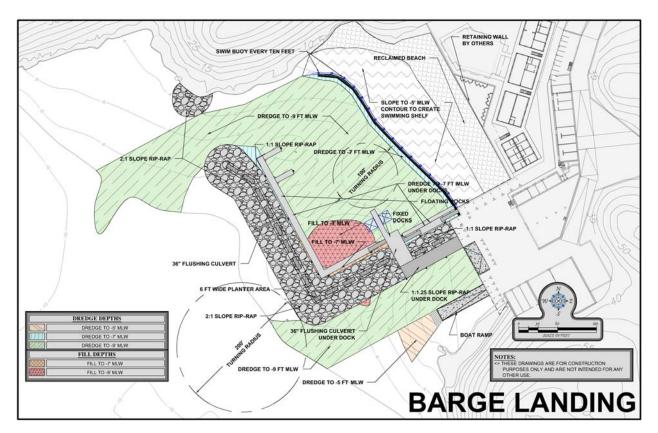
Barge Landing Site Plan (Exhibit 2)
